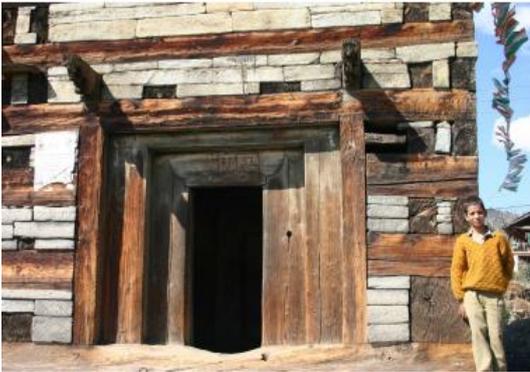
Wood – stone architecture of the walls of the traditional multi-storied structures.
